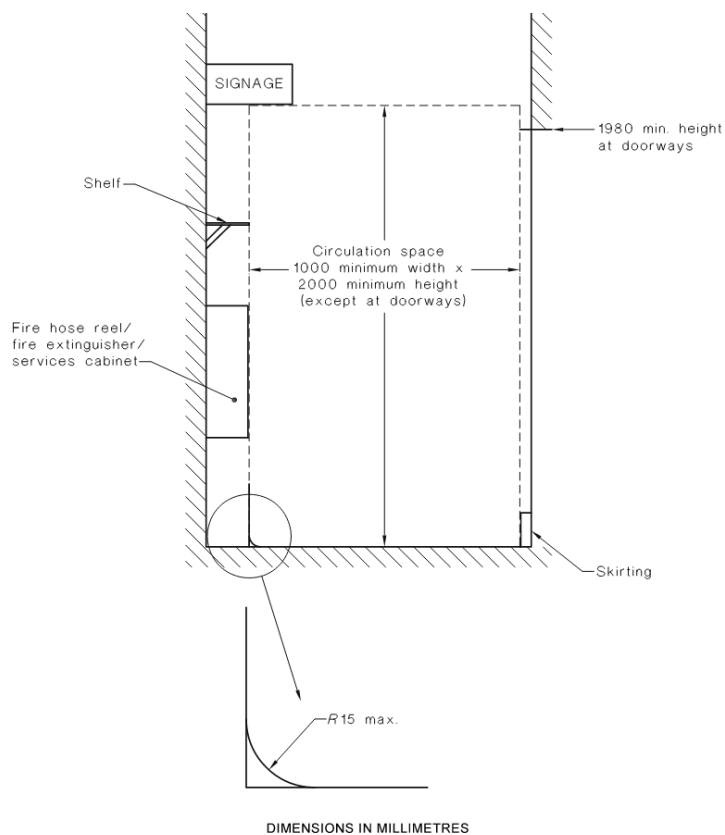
CONTINUOUS ACCESSIBLE PATH OF TRAVEL—MINIMUM HEIGHT AND WIDTH
